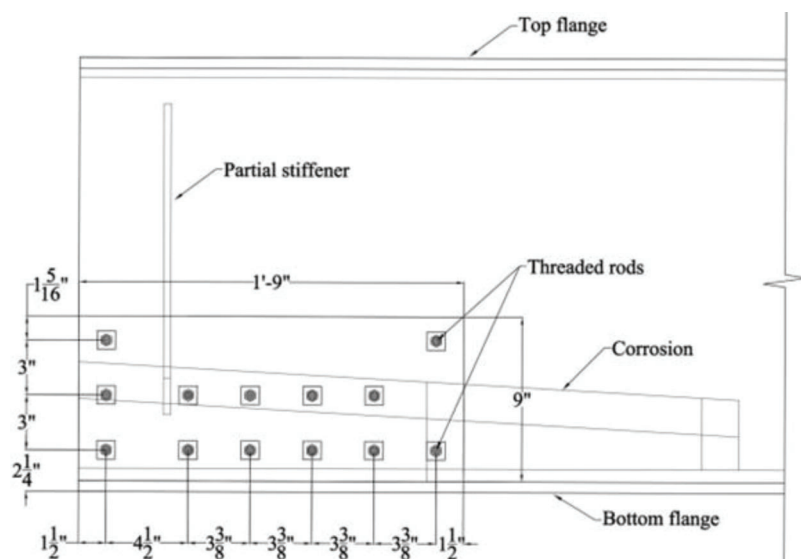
Threaded rod layout for Specimens 6–7: AutoCAD drawing.
